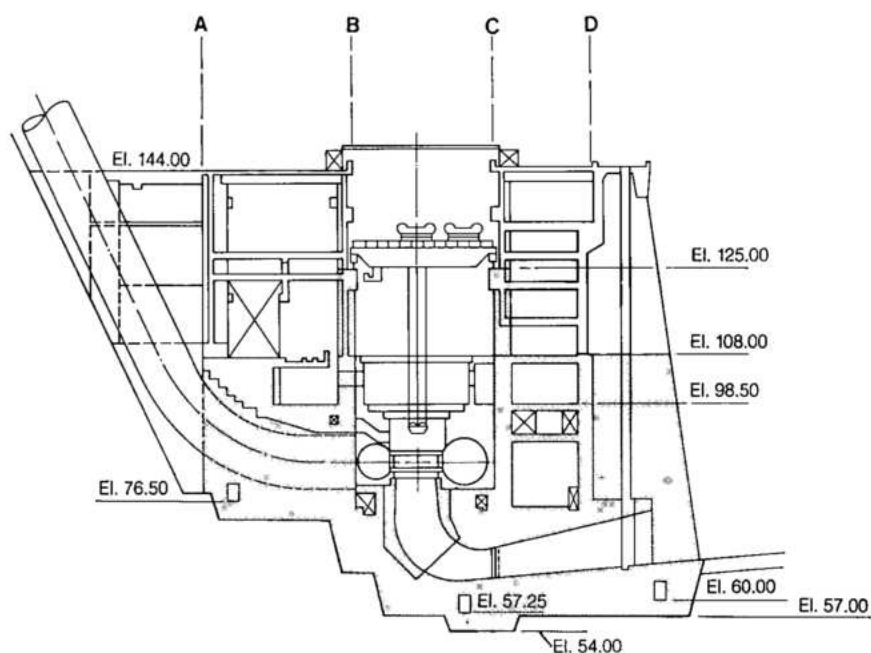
Minimum configuration of concrete in the powerhouse unit required for lowering of stay ring into the turbine pit
